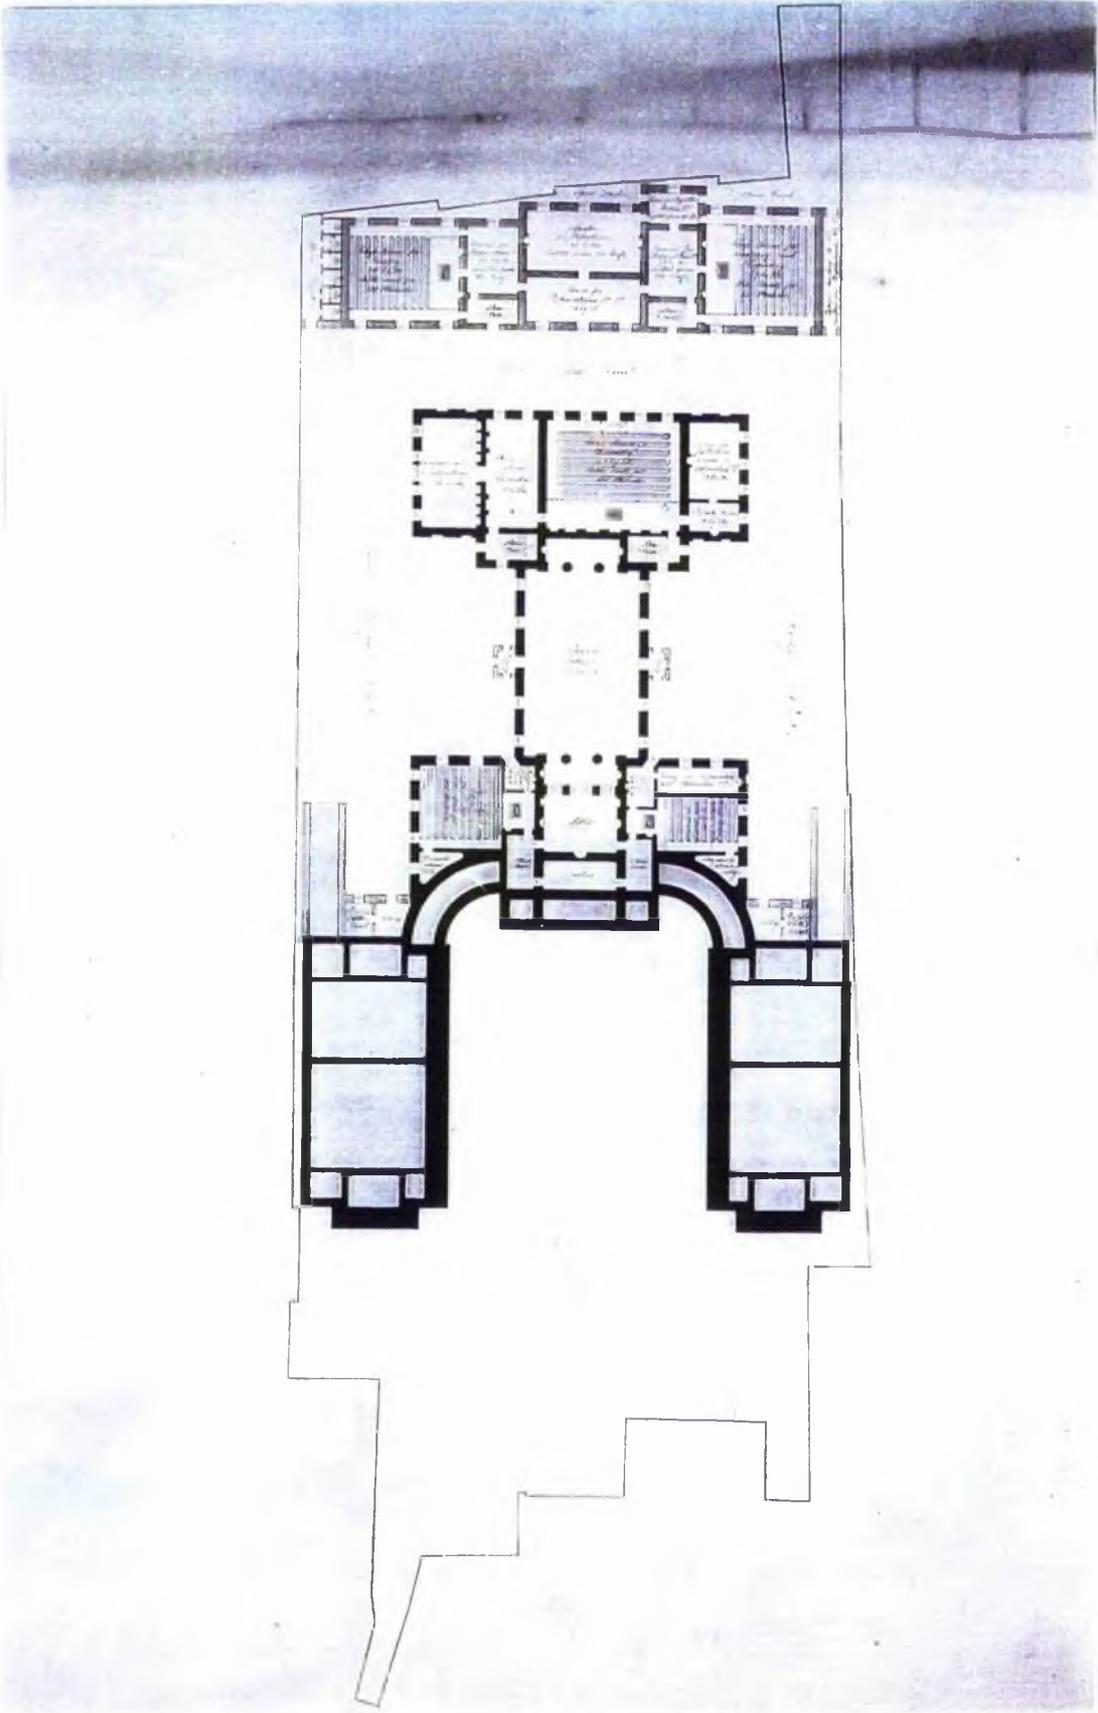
Marischal College. Lower ground floor plan. R. Reid, 1834.
